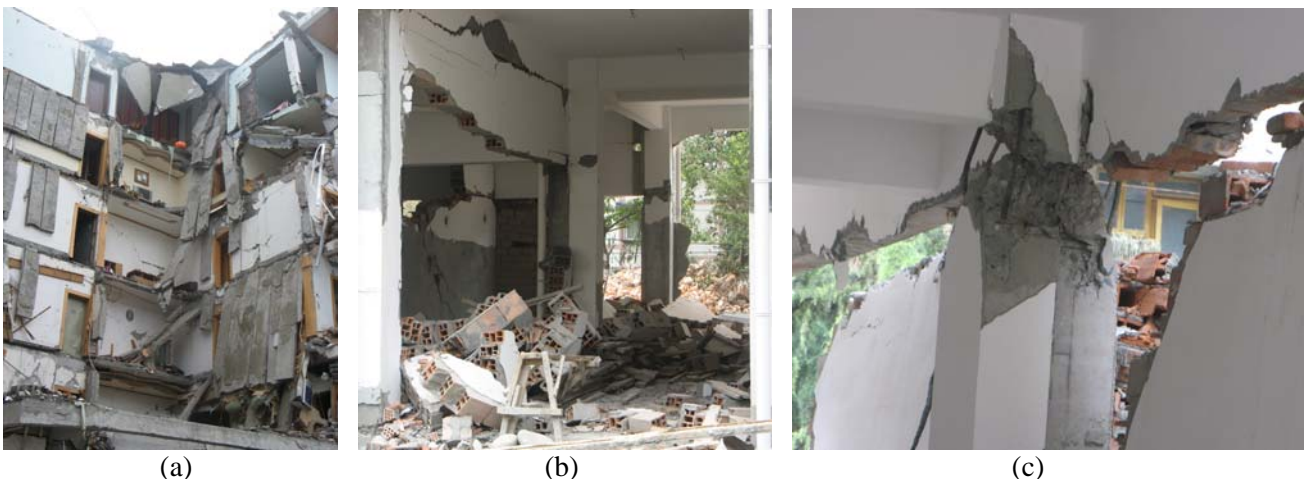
collapses of structures: (a) partially of an office building at Dujiangyan; (b) completely of one school building at Yingxiu (Adjacent building were heavily damaged)
